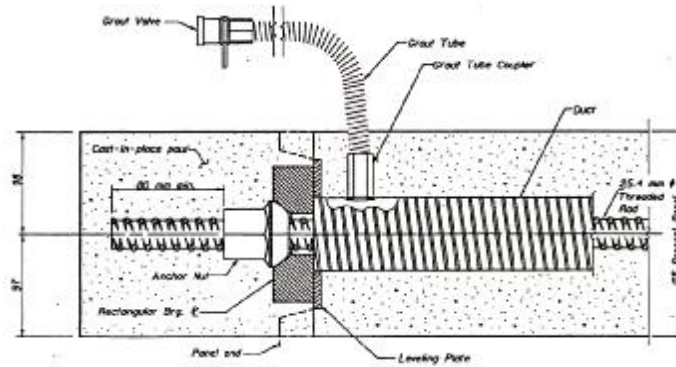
End anchorage detail of the post-tensioned tendon details
